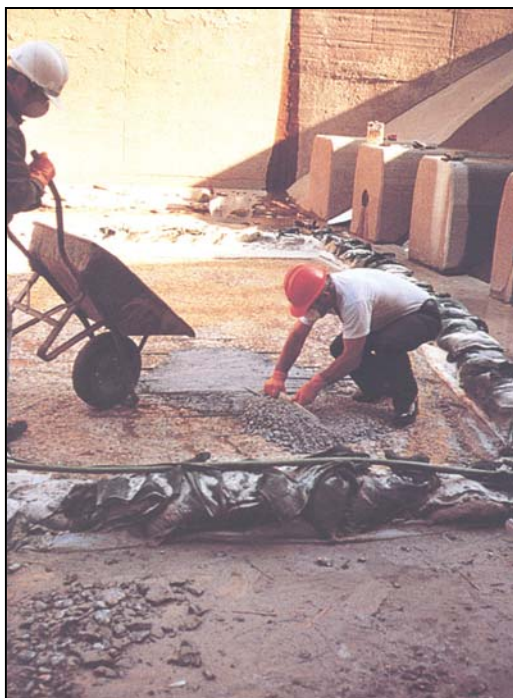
Placing polymer concrete in a repair area. Sandbags and polyethylene sheeting were used to prevent water from entering the repair area.
